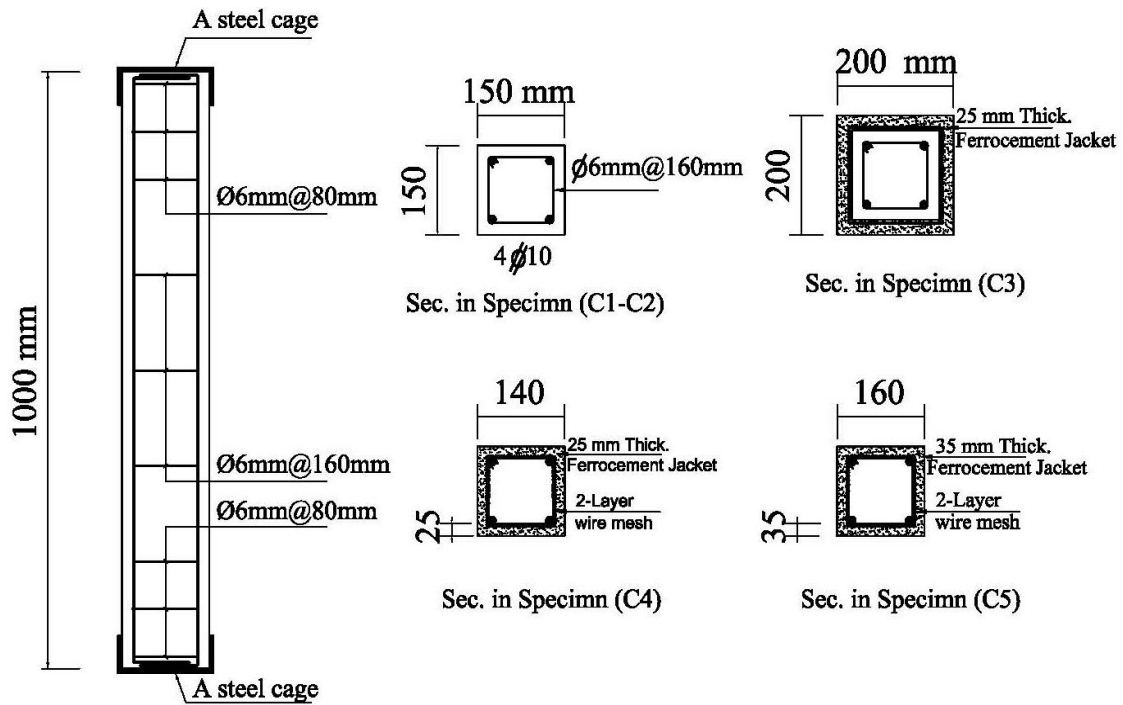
Columns designations, dimensions and reinforcement arrangement.
